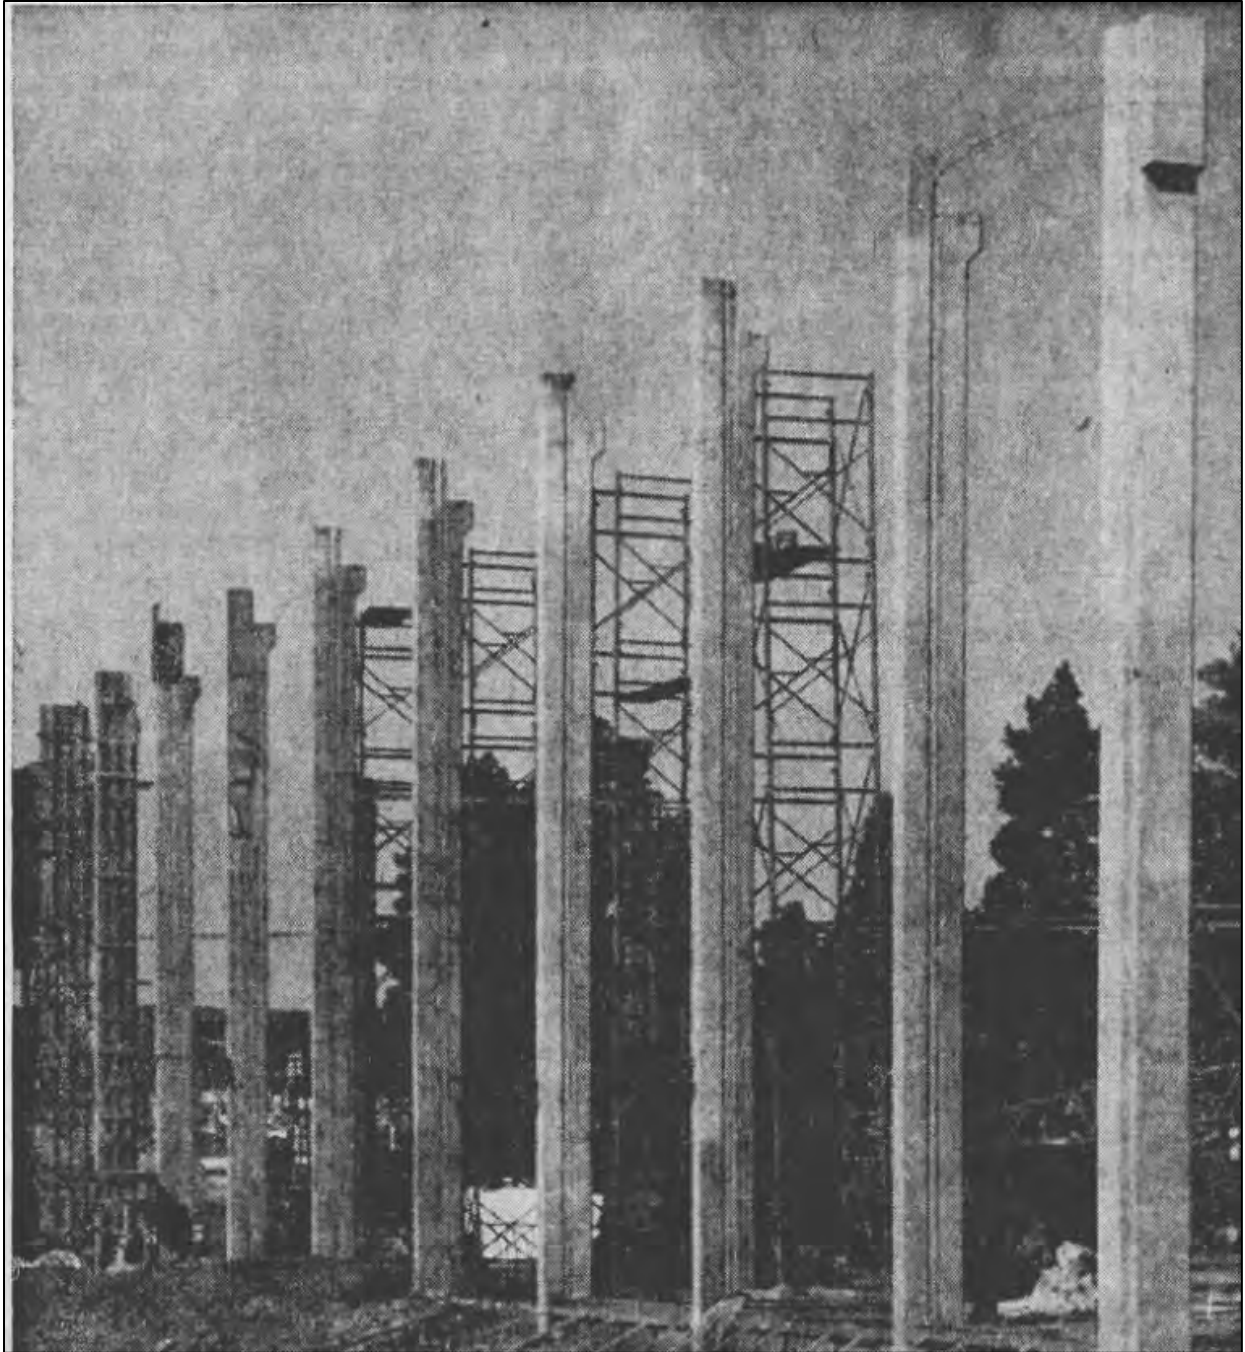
1964 photo of Building 3 during construction showing south warehouse columns (ADS November 9, 1964).
